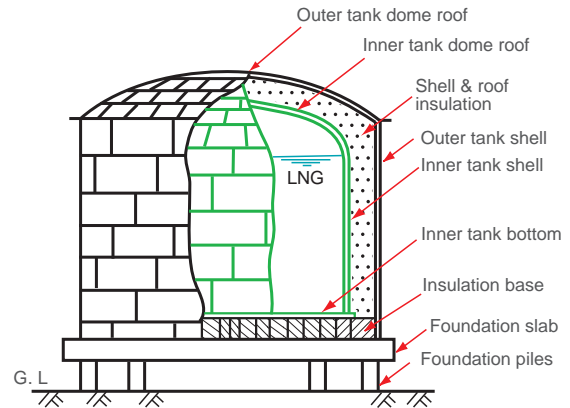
Cross sectional view of the flat-bottom double-shell cylindrical dome-roof LNG tank [3].
